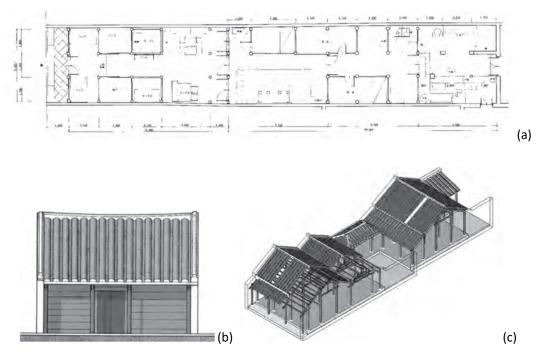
Typical architecture of an ancient shop-house before 1860 in Vietnam: (a) floor plan, (b) elevation, (c) sectional perspective (Hoi An Centre for Monuments Management and Preservation, 2008)
